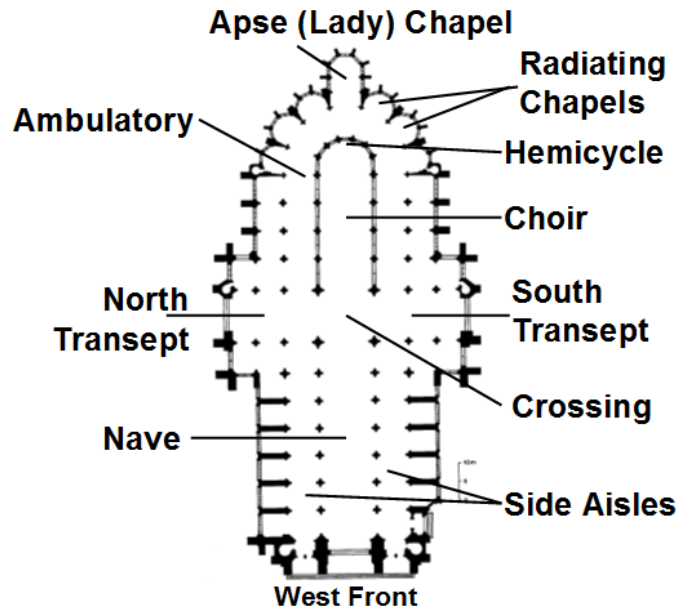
Amiens Cathedral plan, adapted from Grodecki et al. (1978).
